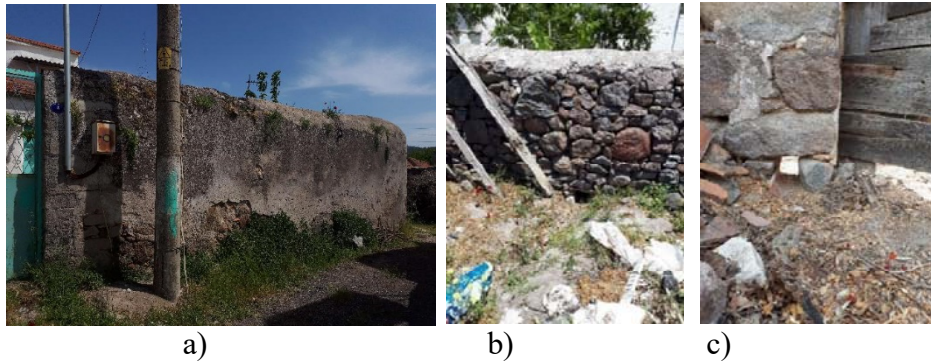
a) Plastered courtyard wall. April 30, 2017. b) Courtyard wall plastered only at top, drainage void at ground level. May 20, 2017. c) Courtyard wall joints plastered, drainage void. May 21, 2017.
